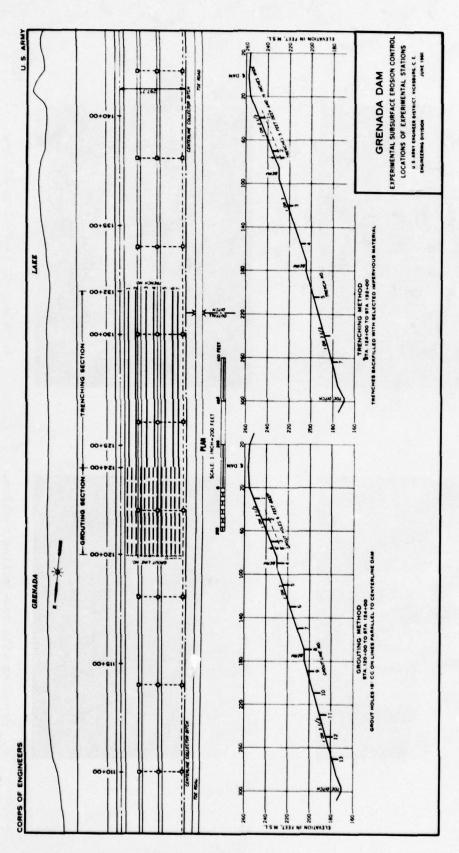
Location of experimental curtain wall grouting and clay-filled trenches, May - June 1960 (from Reference 13)
